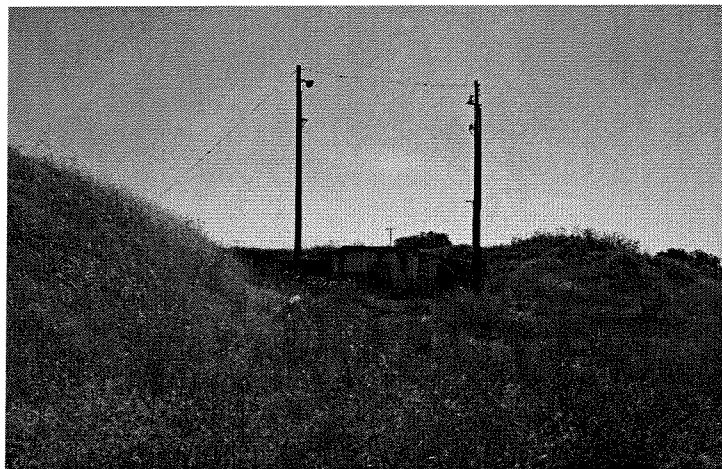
Test Area and Support Building (Unit 95), surrounded by earthen berm, Sigma Test Area, 1956-1961. Looking east. View of May 2005.
